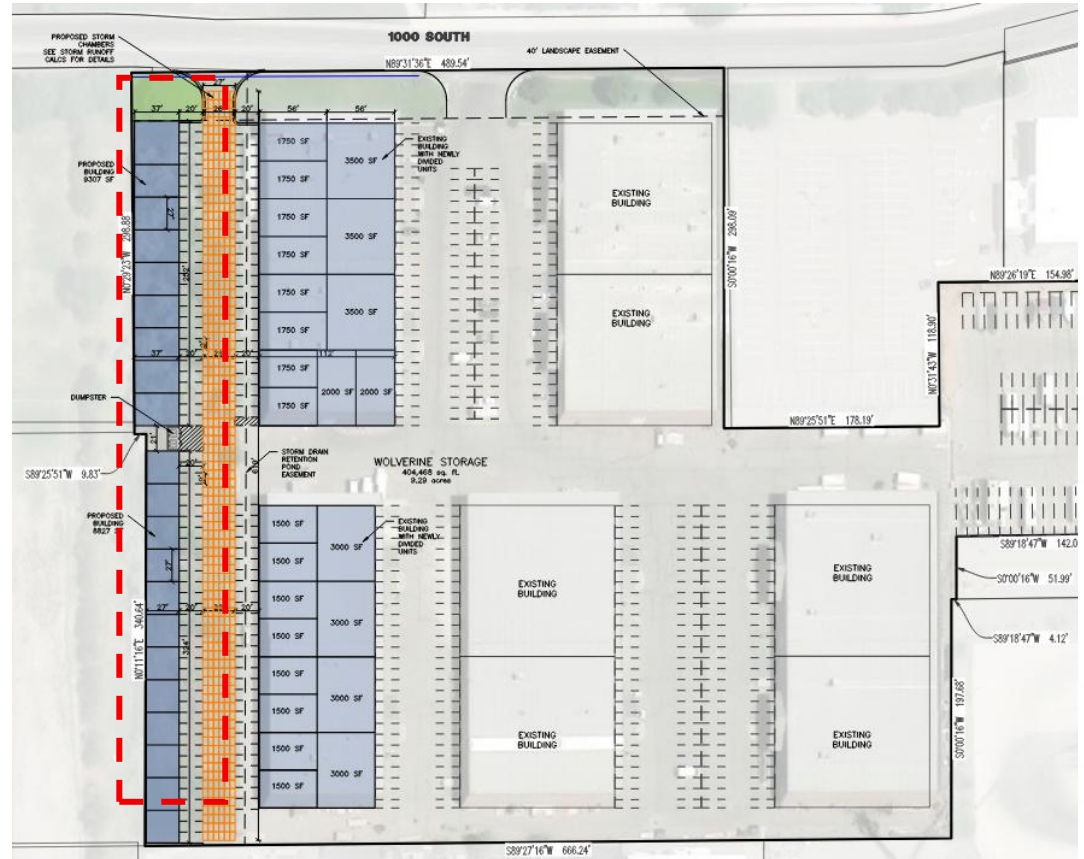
Concept Plan, Wolverine Storage, the currently undeveloped area of the property highlighted
